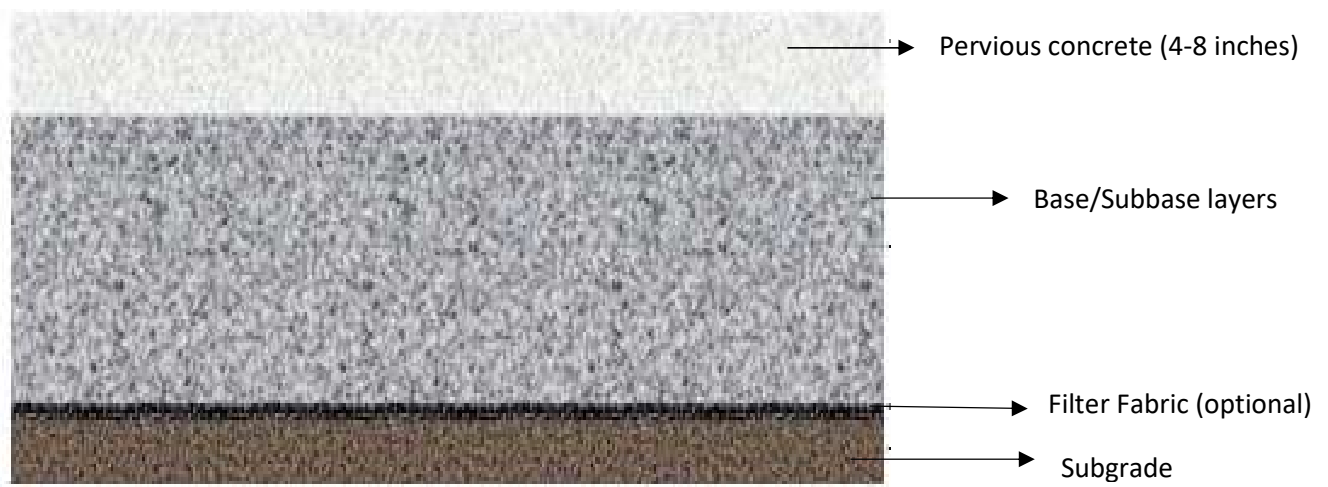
Typical pervious concrete pavement cross section (adapted from EPA 2010).
